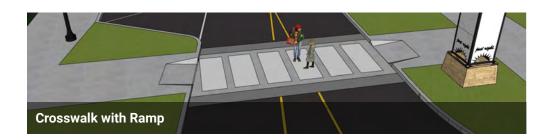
Pedestrian-oriented view showing proposed paving pattern design
